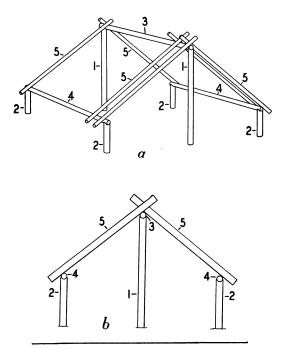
Basis of Arapesh House Form and Exact Form of Unwalled Shelter used as Cook House and Lounging House in Hamlet. a, Side view; b, Front view. 1, One pair of posts supporting ridge pole; 2, Two pairs of wall posts supporting wall plates; 3, Ridge pole; 4, Wall plate fitted in notches in center of upper ends of wall posts; 5, Rafters.
